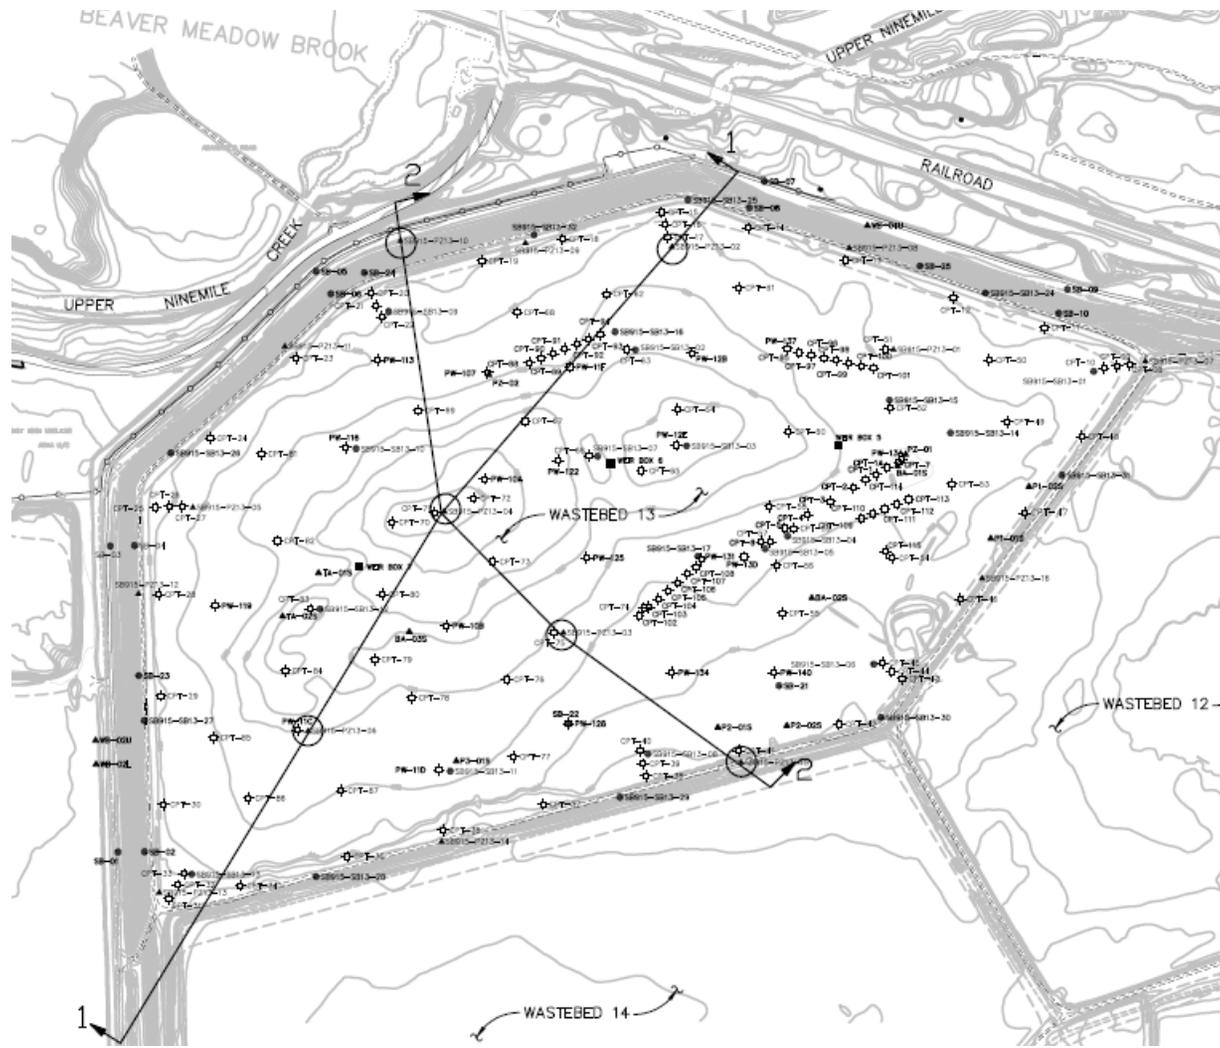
Locations of Cross Sections Showing Measured Groundwater Table Elevations
